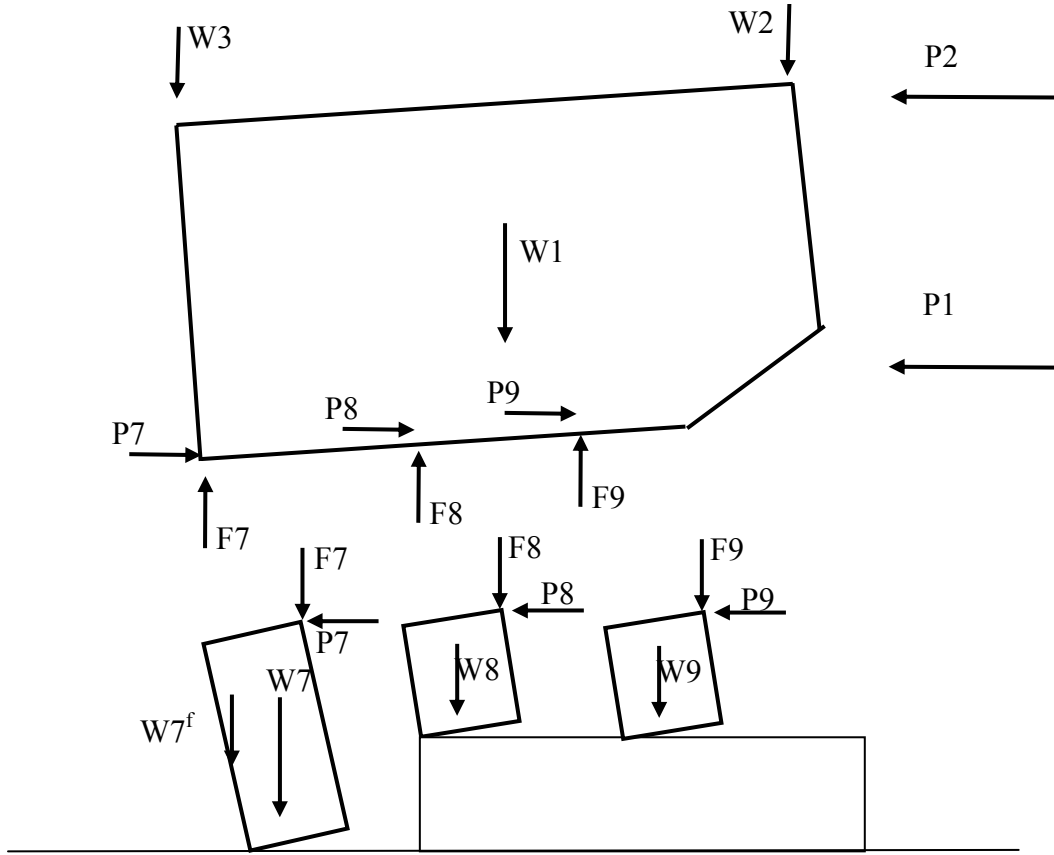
Kinematic movement of Wall B with sliding between spandrel and piers (push direction)
